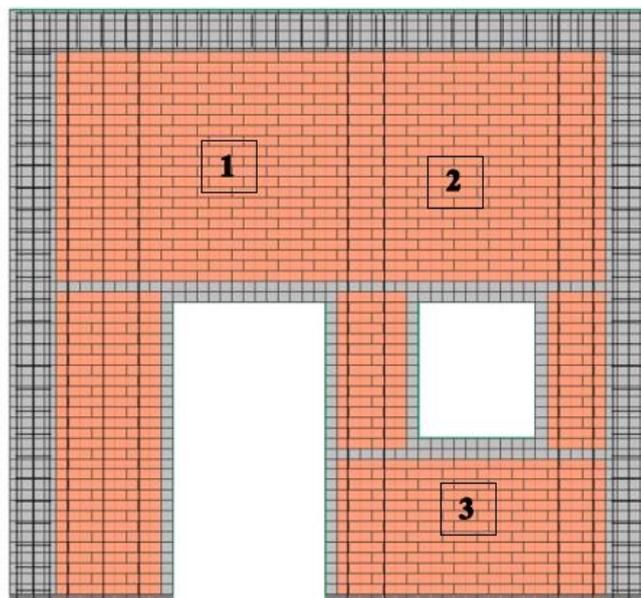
Vertical reinforcement develops 3 strong components in wall
